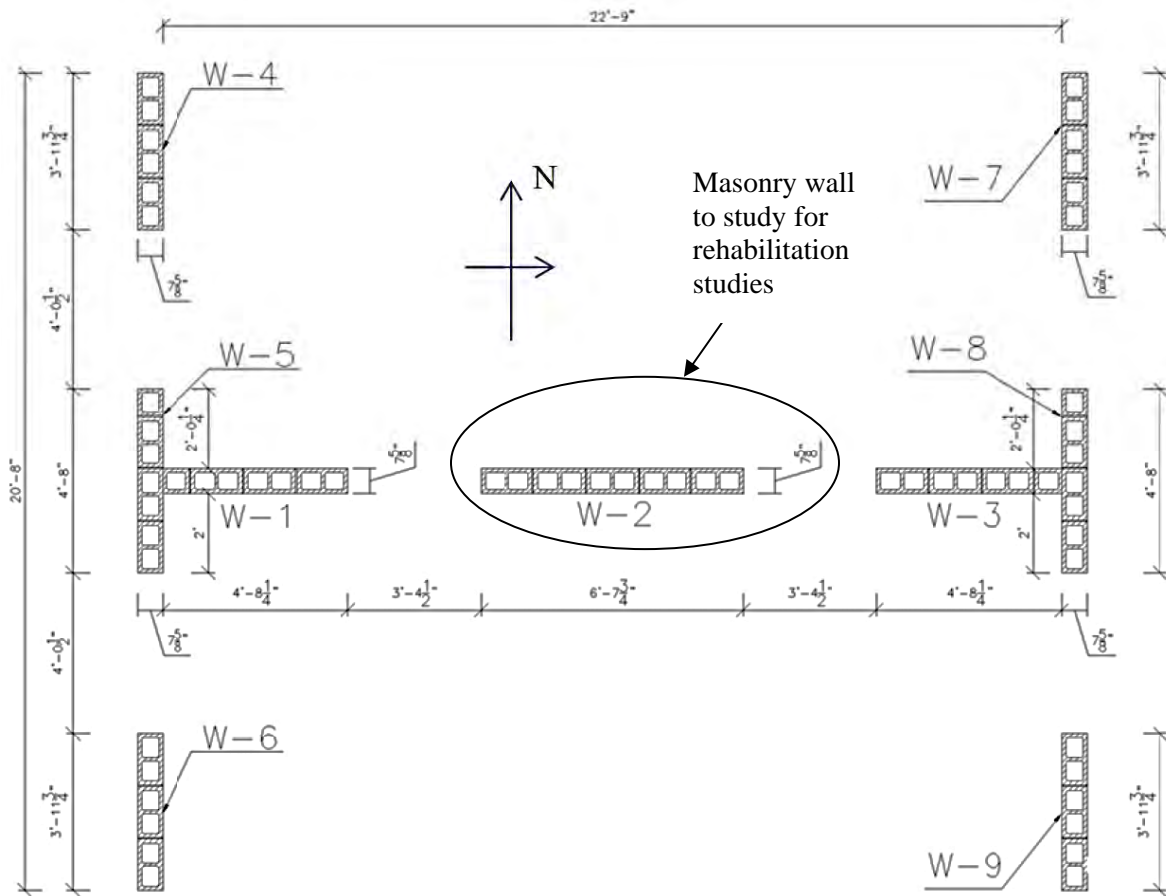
Plan view of wall layout of the three-story specimen (Stavridis 2011)
